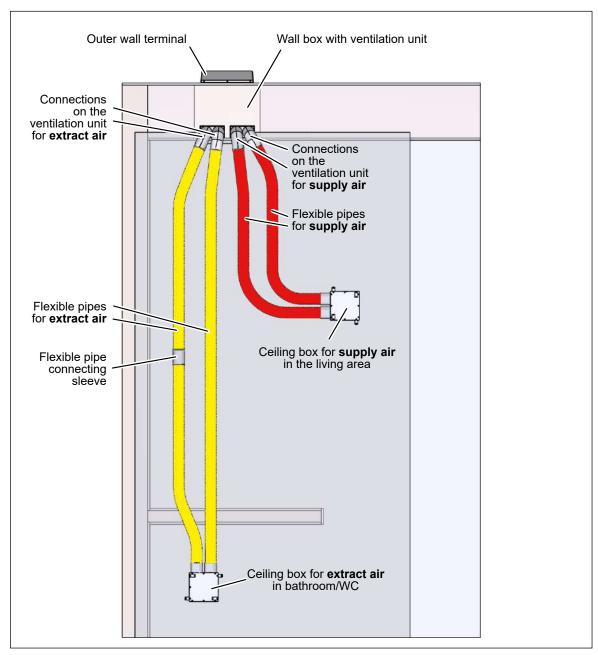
Running extract air flexible pipes and supply air flexible pipes
